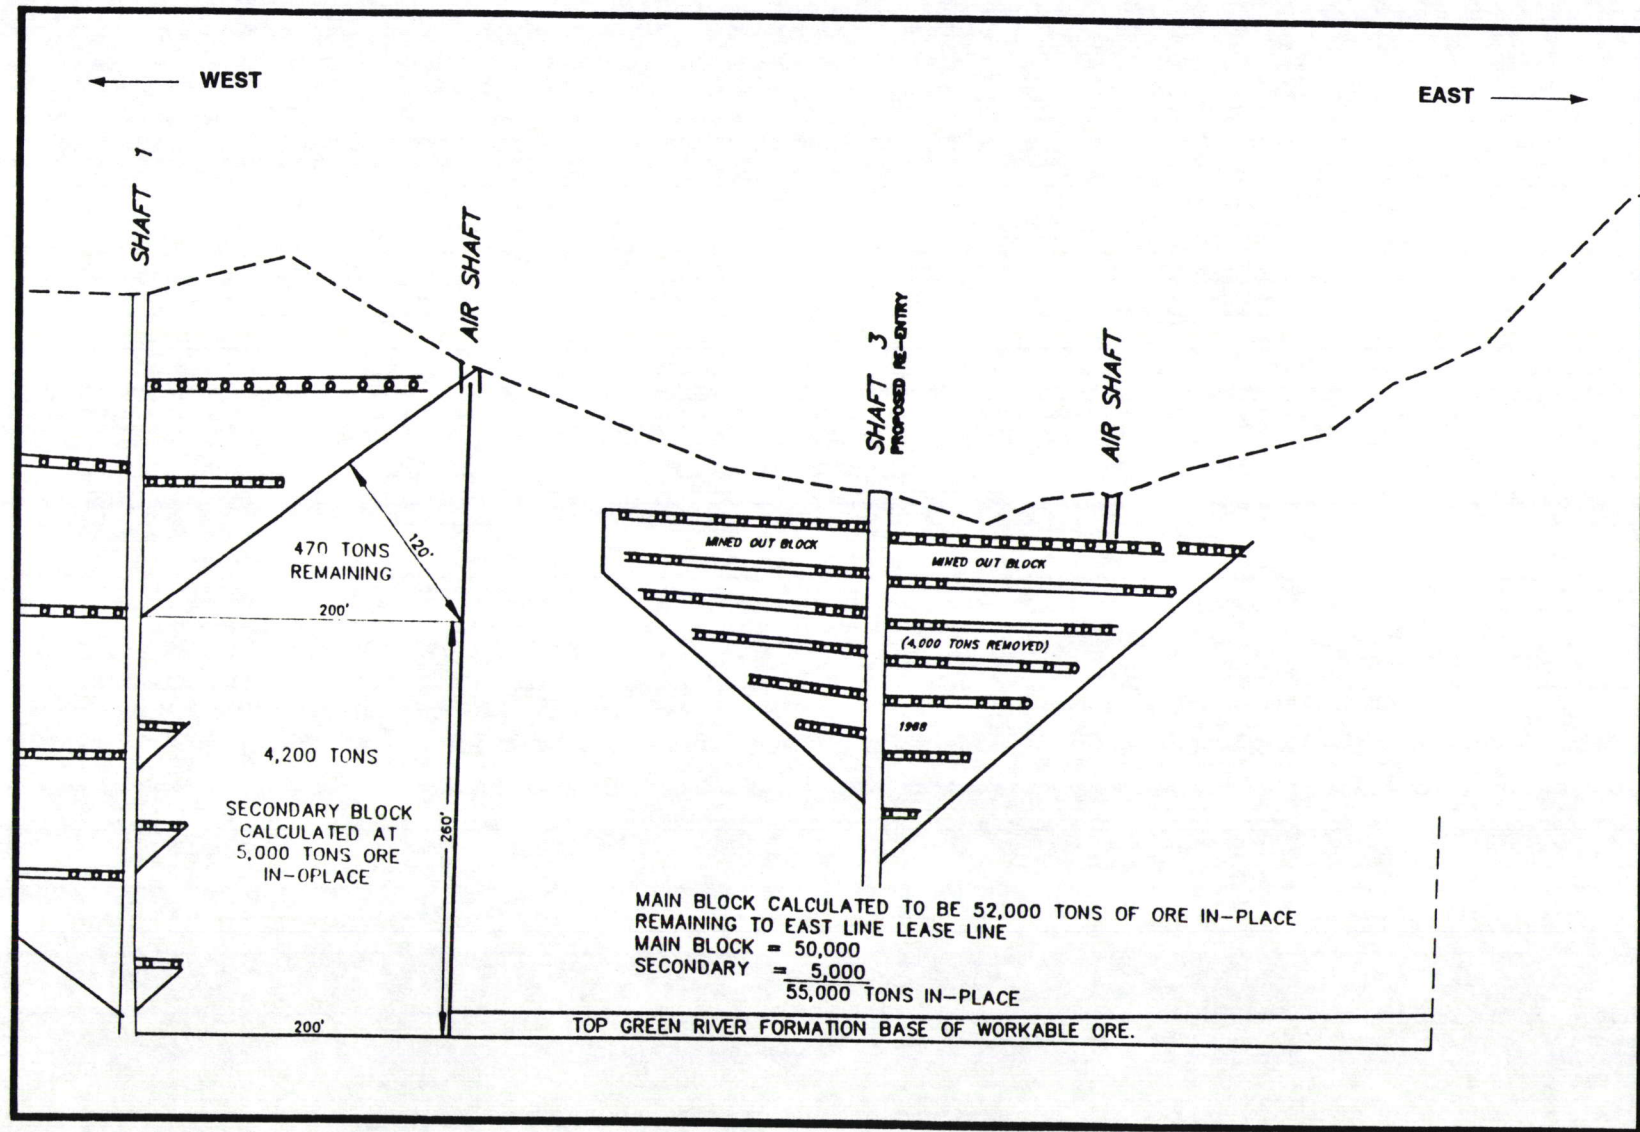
Cross Section of Proposed Mining at Shaft No. 3 of Tom Taylor Mine.
